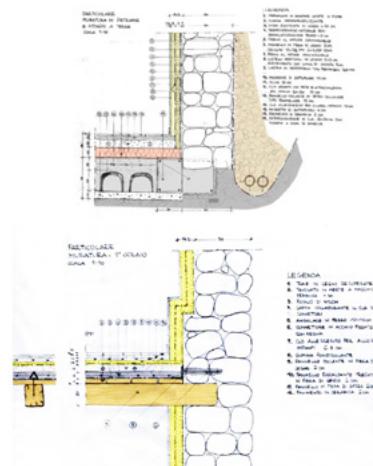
upgrade buildings energy efficiency - study on the stone walls/ étude sur mur en pierres
